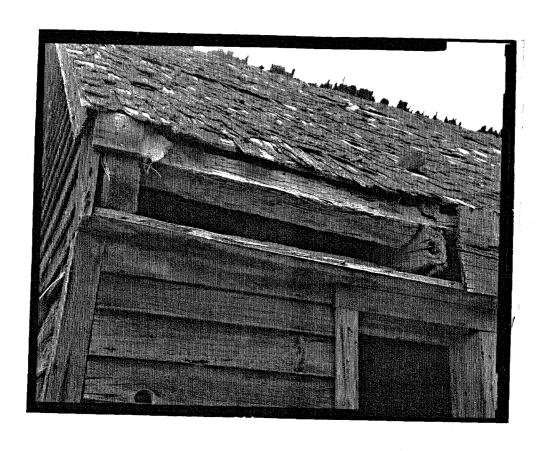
Hermitage Quarter, detail of cornice on west elevation looking southeast.
